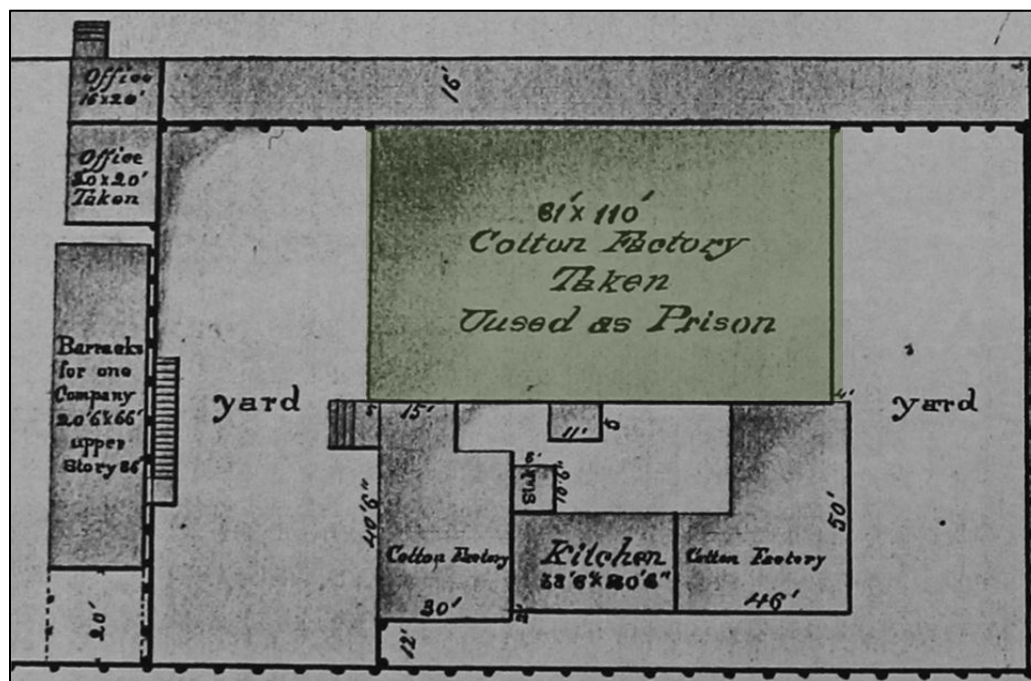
1865 Washington Street Military Prison, original footprint of building highlighted in green. Courtesy of Alexandria Local History Special Collections.
